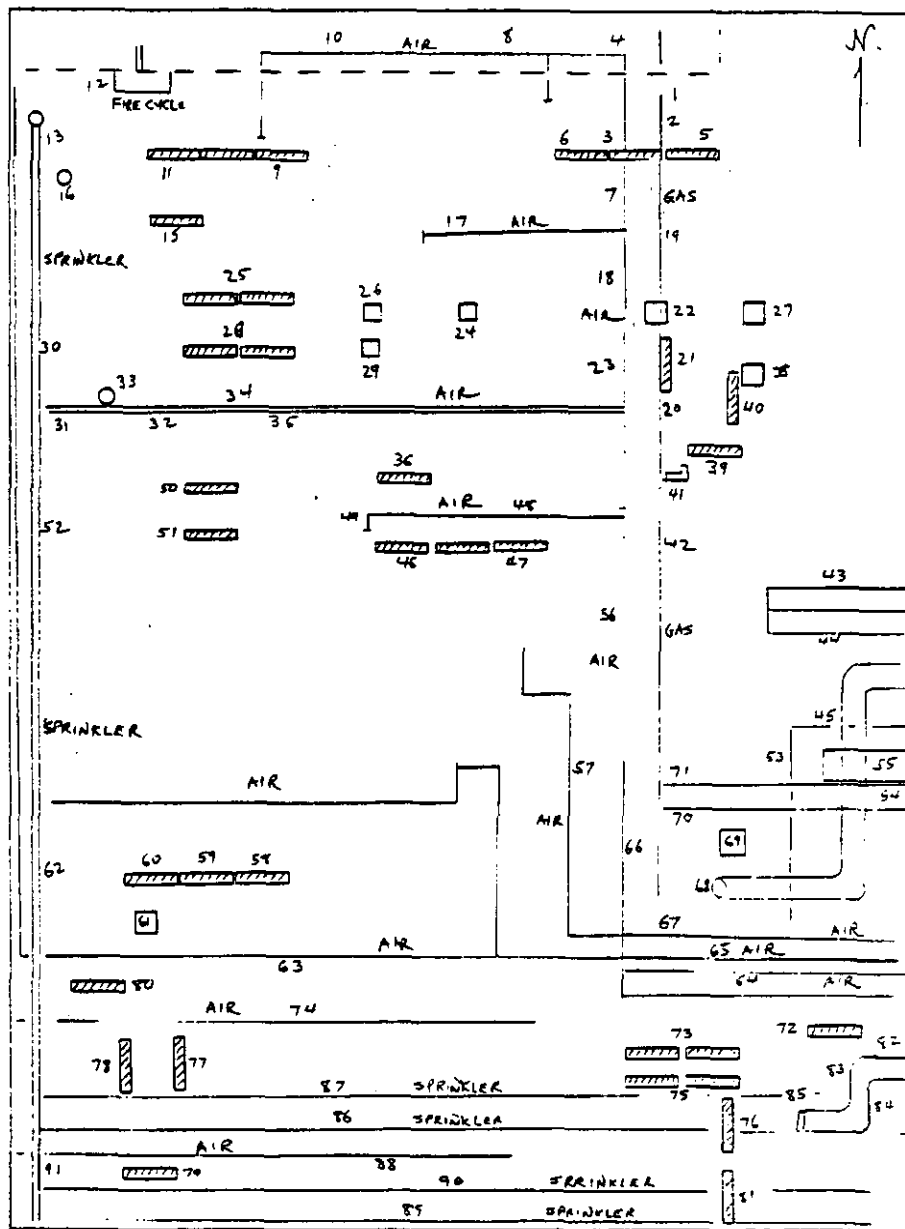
PFDL Laboratory Area Miscellaneous Fixtures Layout and Survey Locations
